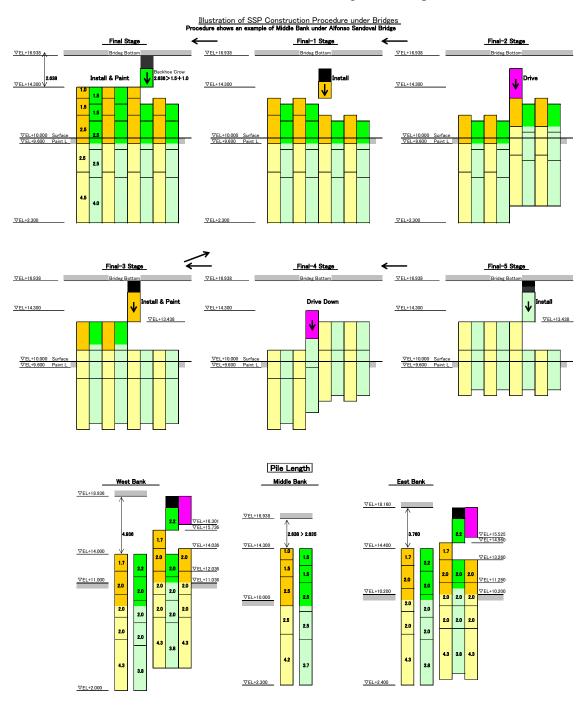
Illustration of SSP Segment at Bridge Portion
